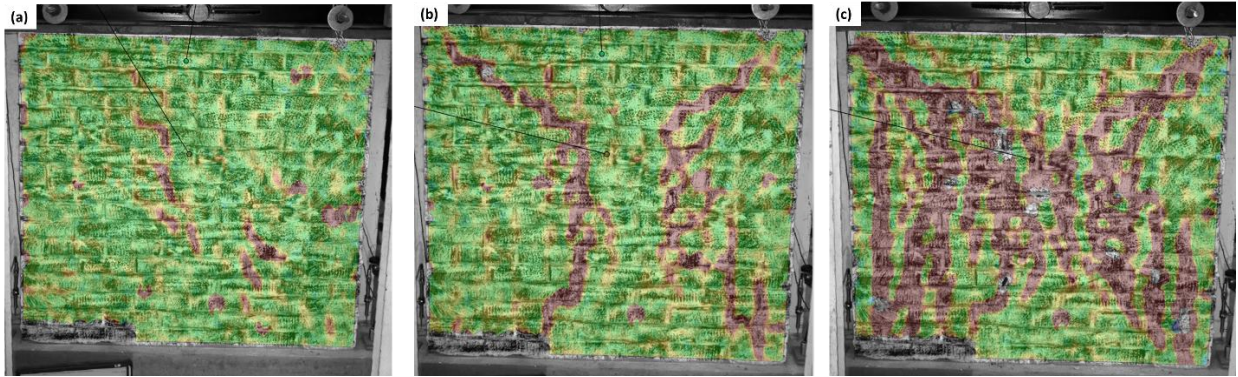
Initial crack formation (a), development of shear/crushing cracks at the center of the panel (b), and (c) crack pattern in correspondence of the failure for masonry wall HC_129_B_30.
